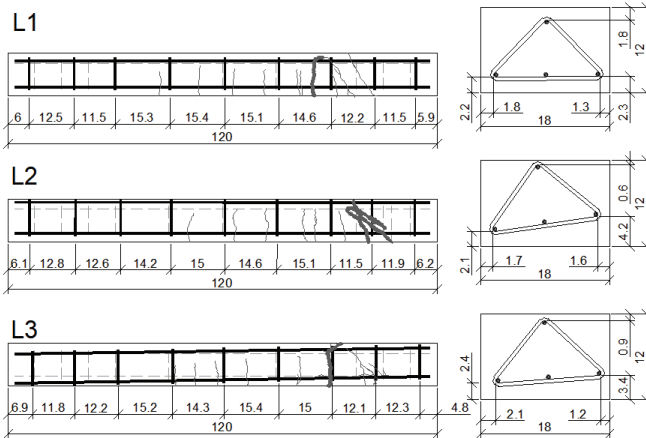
View and cross section of real reinforcement distributions and crack after failure
